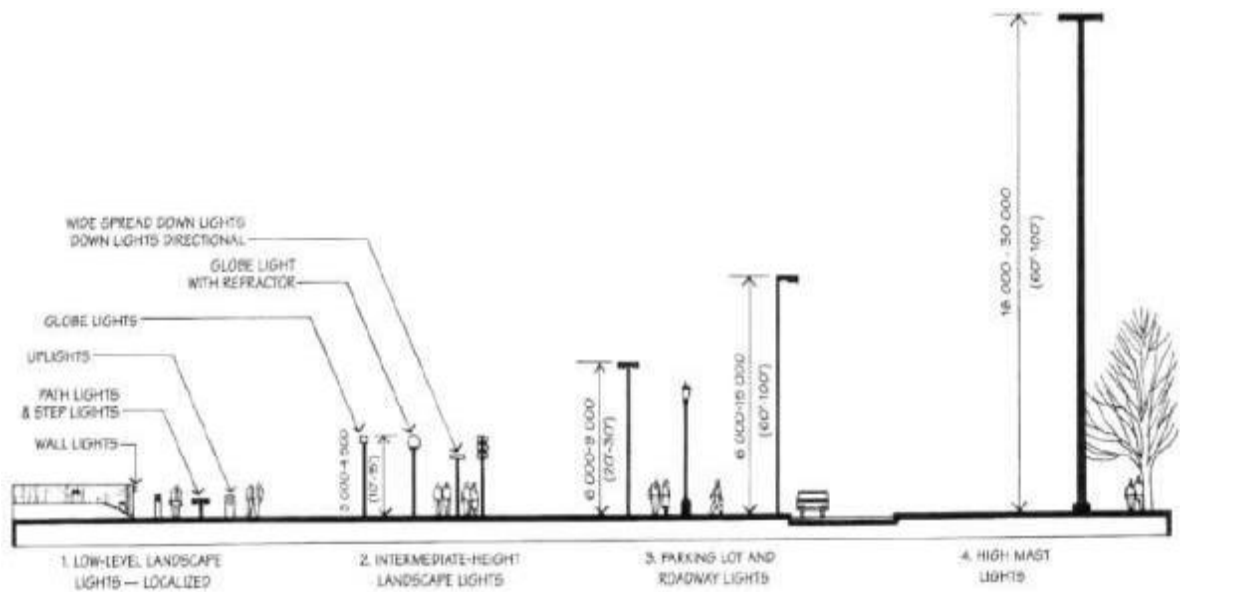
■ Examples of types of exterior lighting fixtures.
